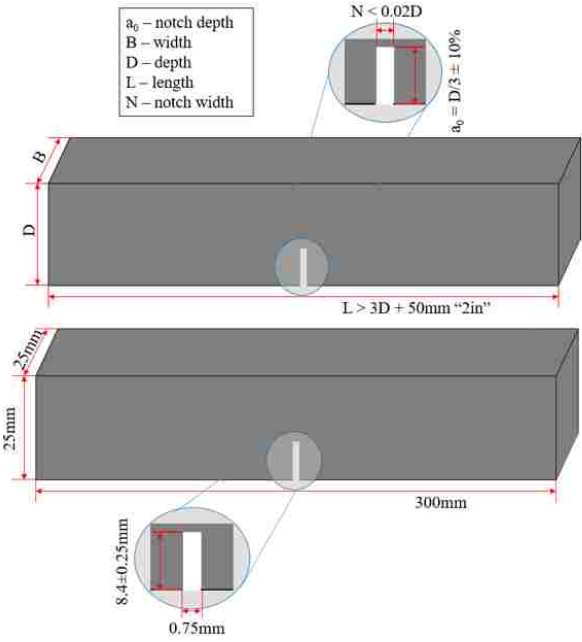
Dimensions and schematics of fracture specimen per ACI 446 and as used.
